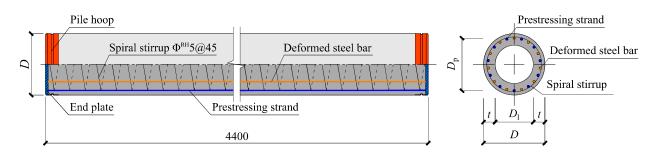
Schematic diagram of reinforcement in PSRC piles.
